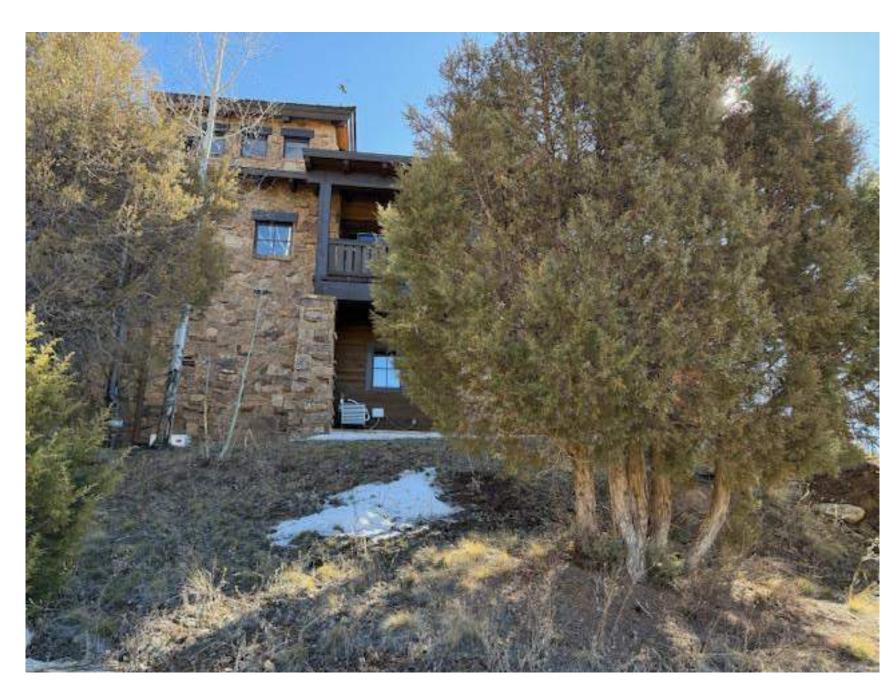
PHOTO FROM WEST DRAINAGE EASEMENT LOOKING UP AT WEST SIDE OF BUILDING
